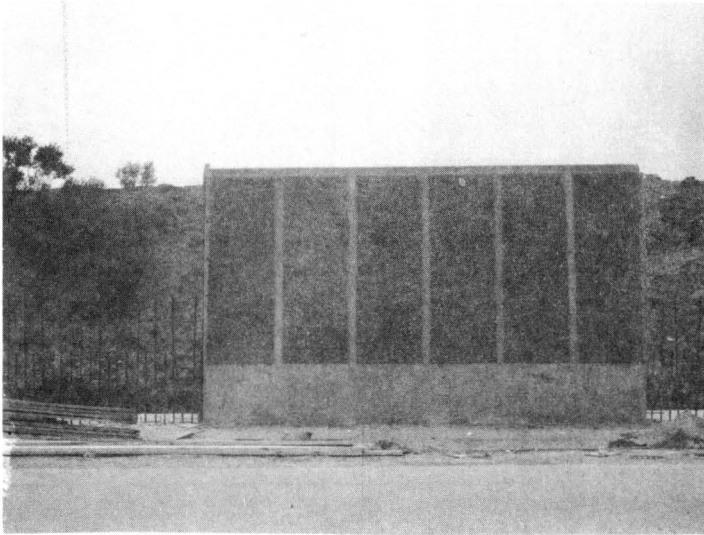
View of retaining wall at the west Belfast overpass and US 59.
